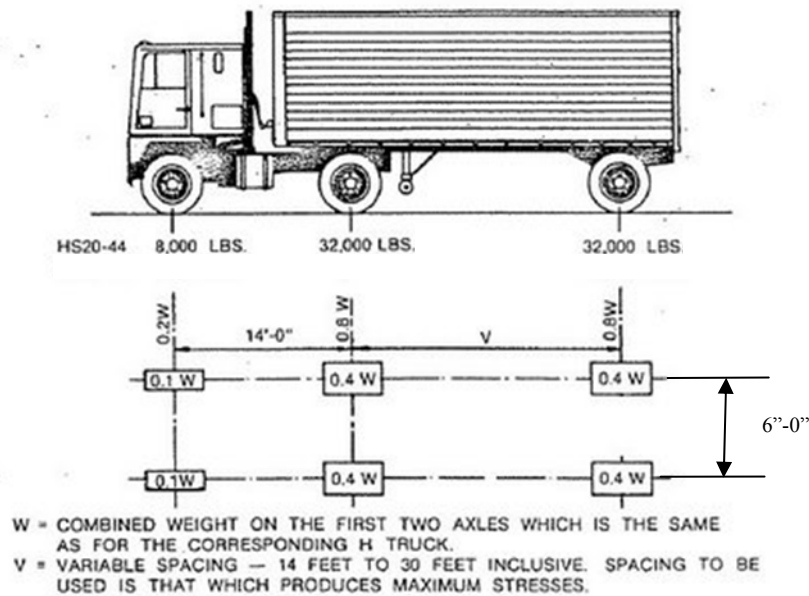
Standard HS-20 Truck Loading (AASHTO 2010)
